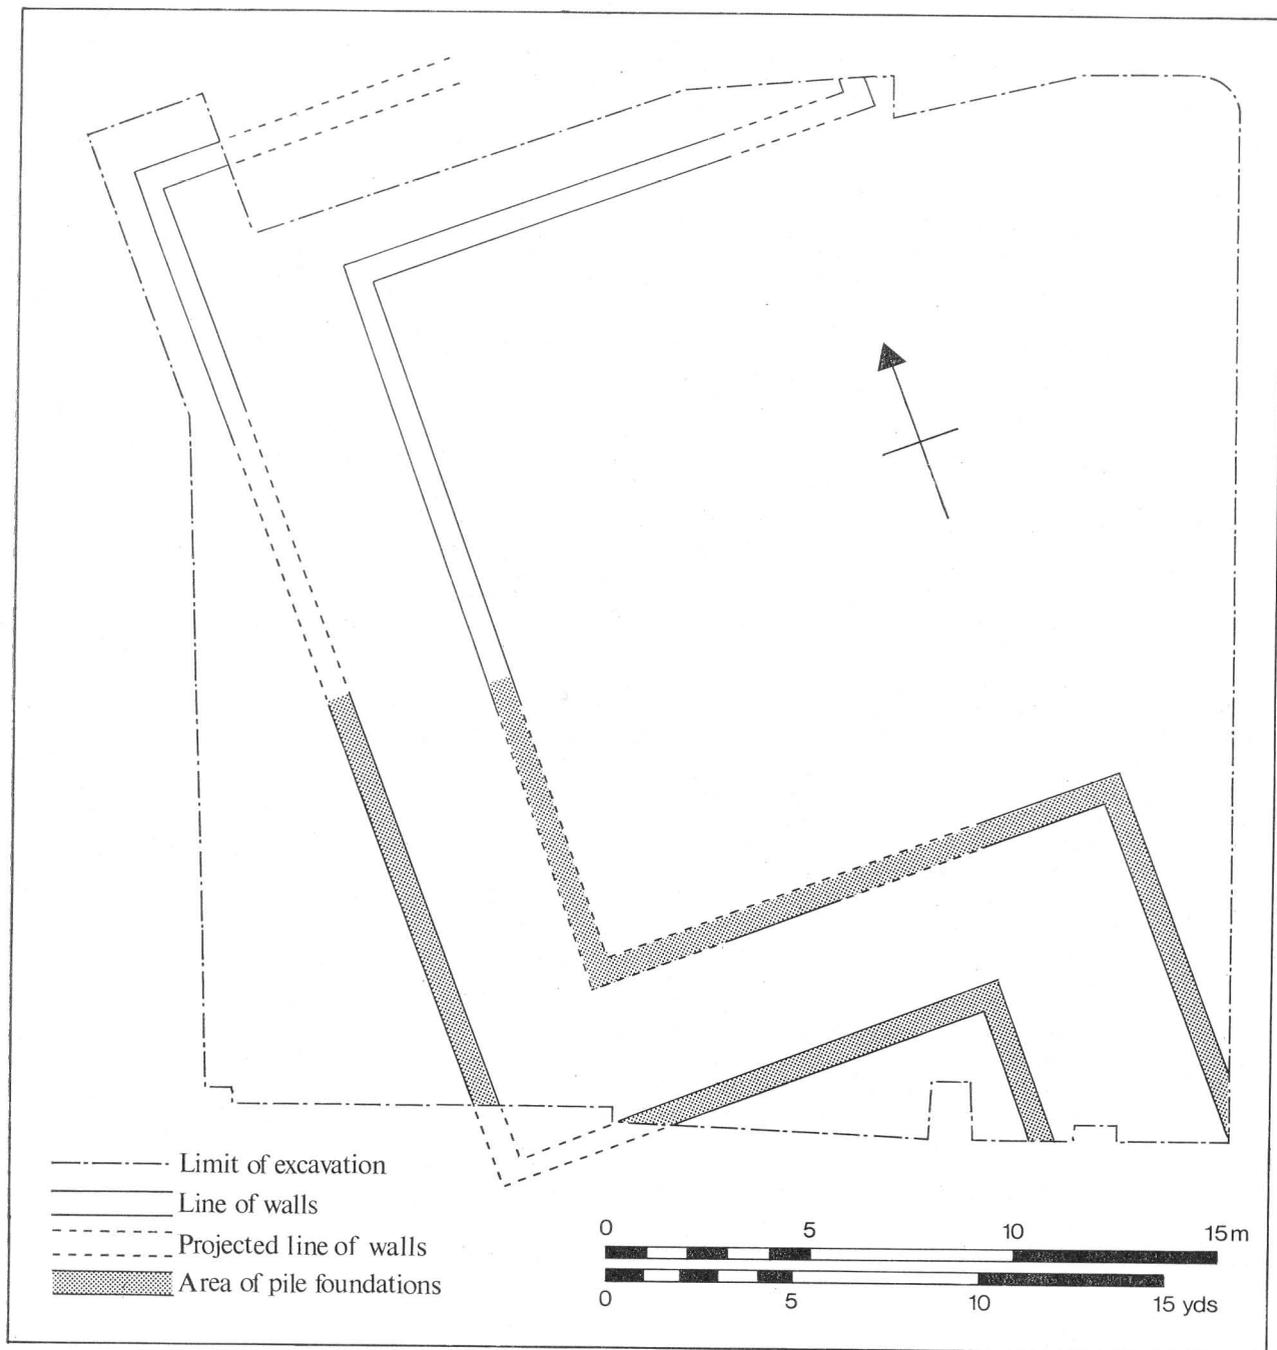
15-23 Southwark Street, plan of the walls of the early Roman building.
